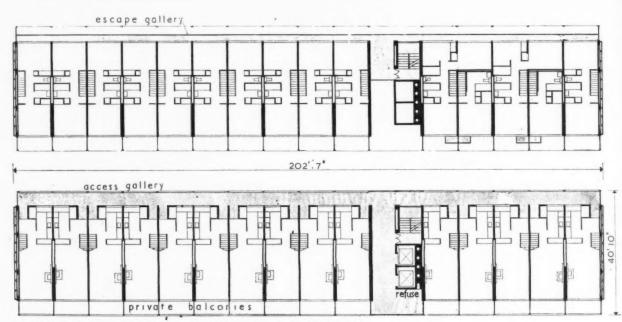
Typical plans of 11-storey block. Above, plan of bedroom floor; below, plan of ground floor.
